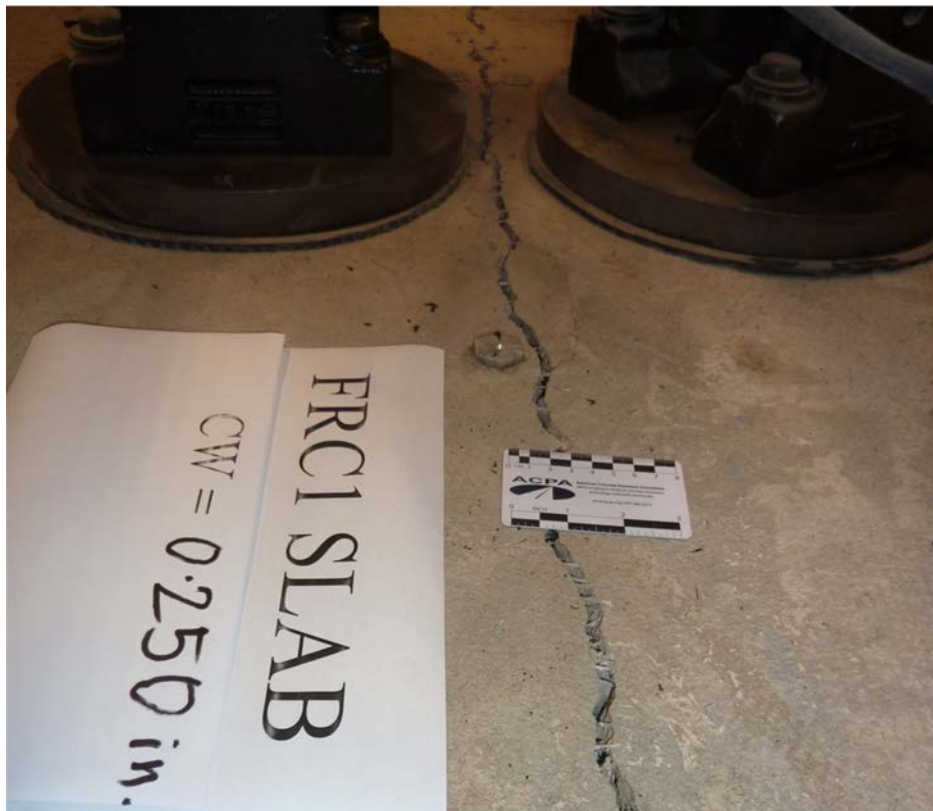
Fibers bridging the crack even at 0.250-in crack width, top view.
